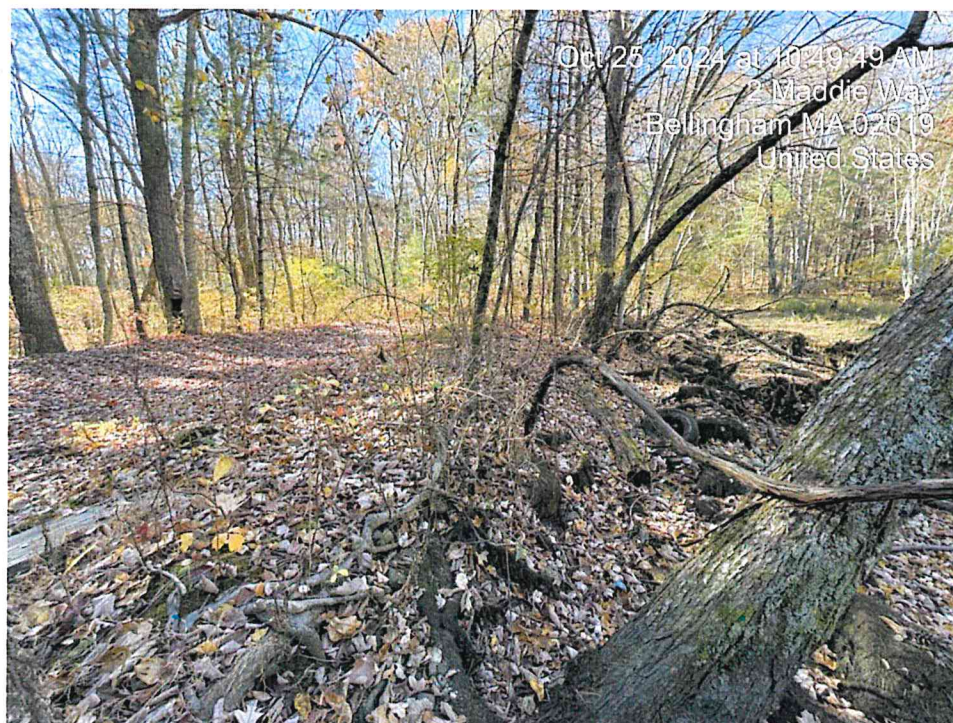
A photo (facing west) of the existing location of the gravel roadway & the adjacent wetland within the area of the proposed improvements.
